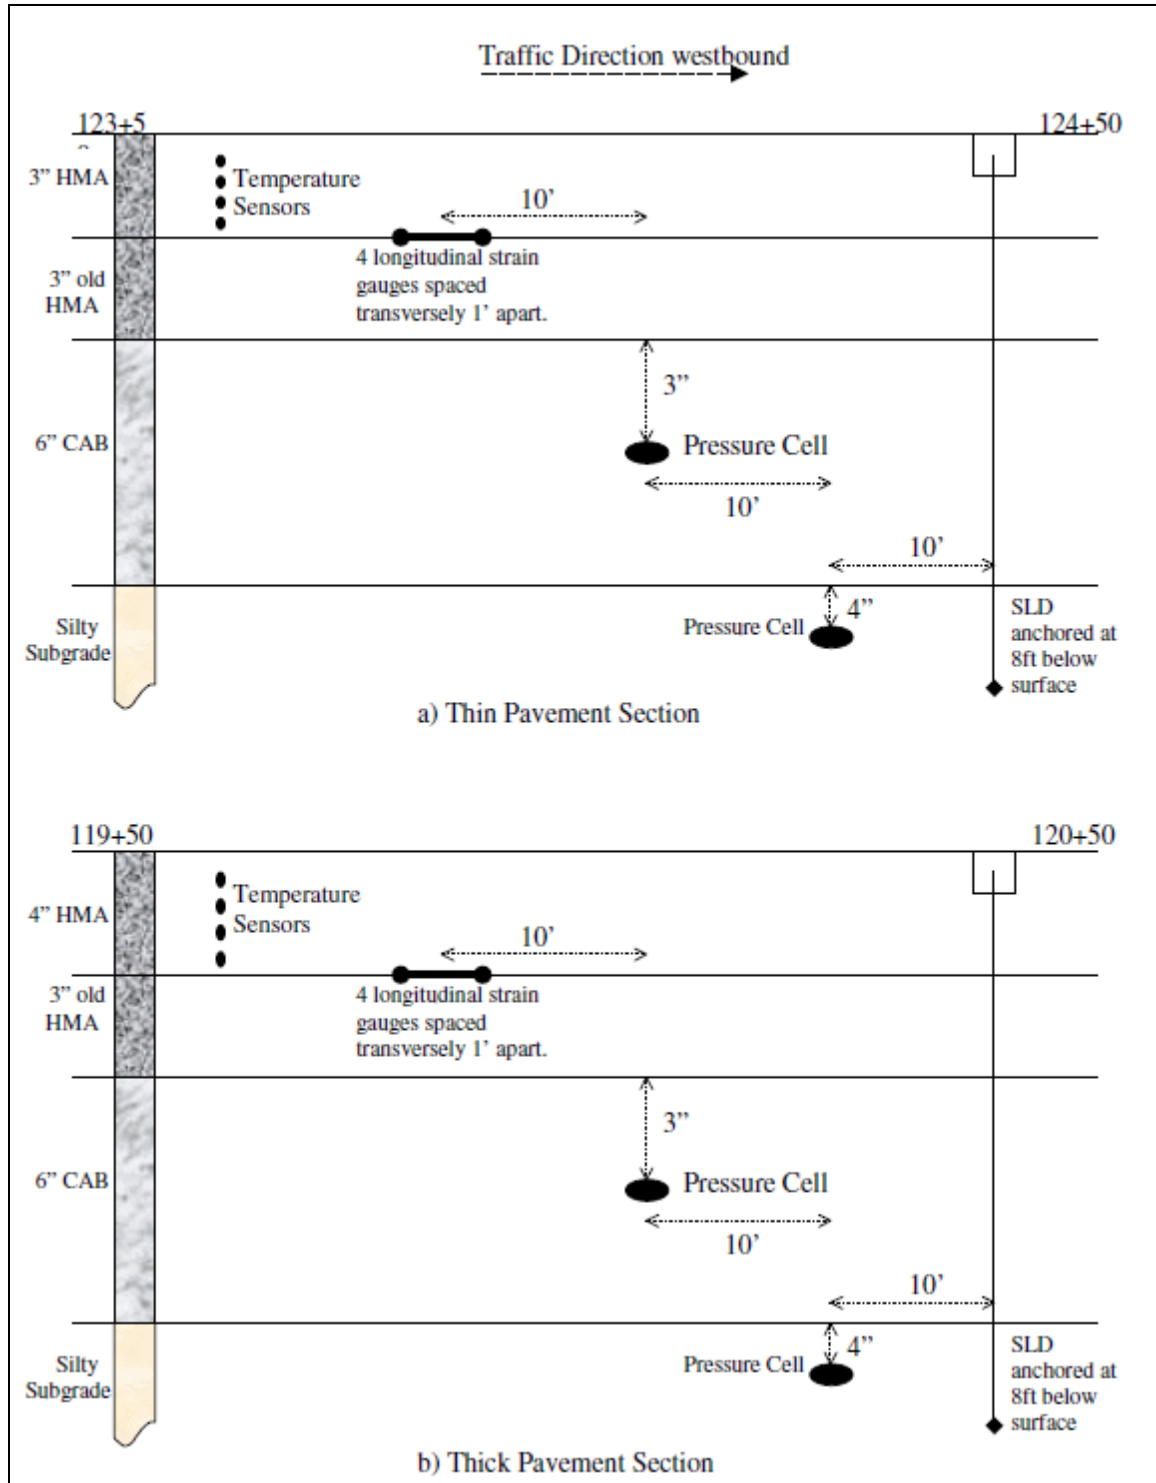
Layout of Instrumentation on SD26 Sections (Sebaaly, 2002)
